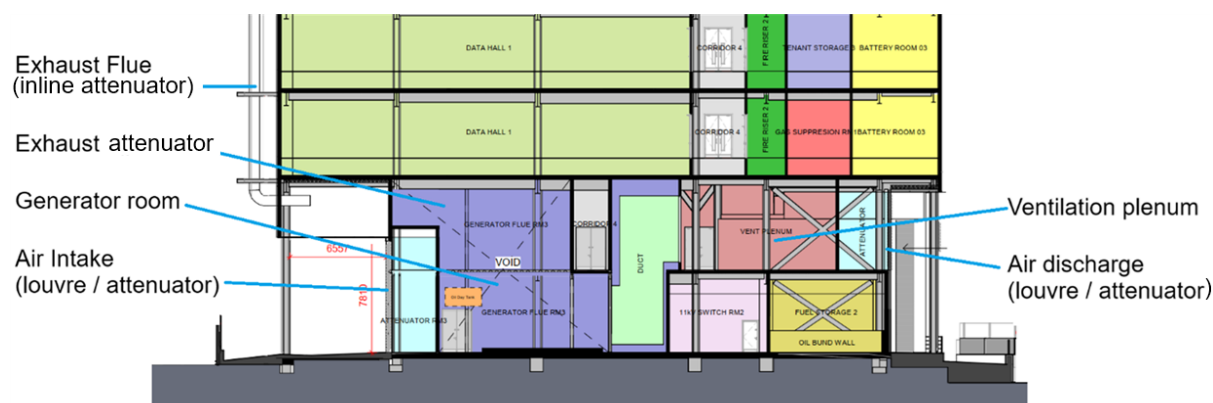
TW2 Ground and Mezzanine Section Plan (marked up)
